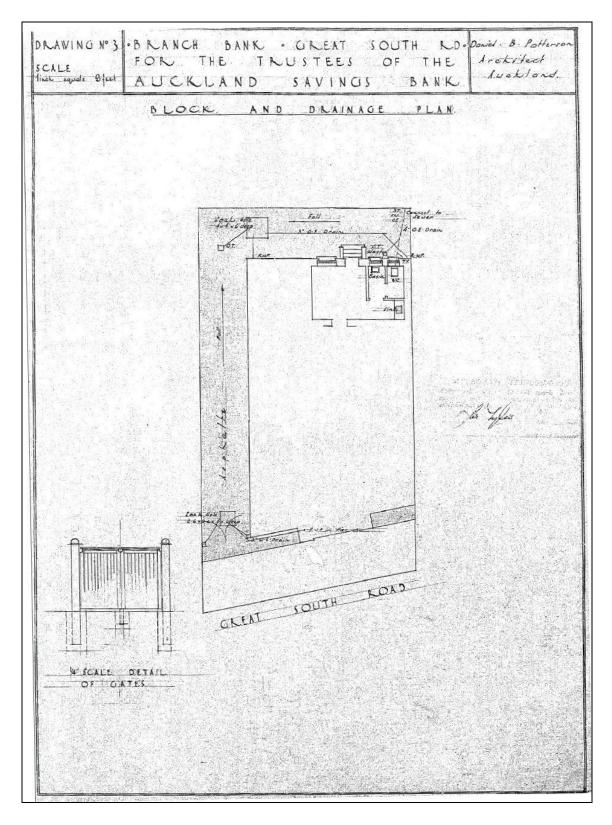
Auckland Savings Bank – Great South Road – 1934 'Block' and Drainage Plan. Drawing No.3. Auckland Council Filenet. Accessed May 2016.
